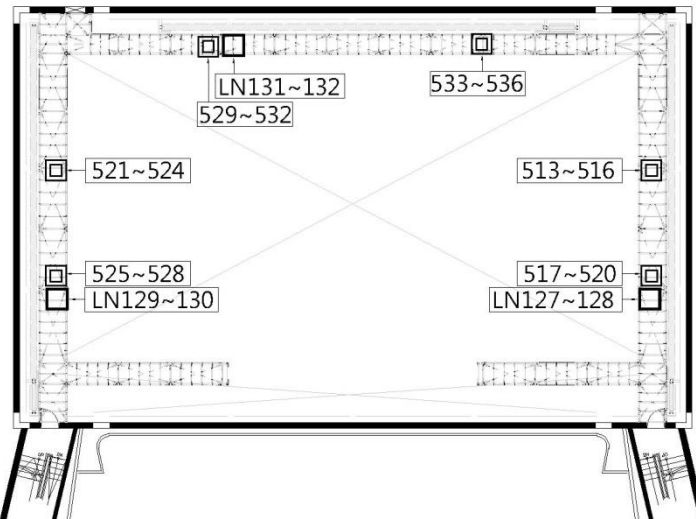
The Fourth Floor Gallery Lighting Circuit Layout
